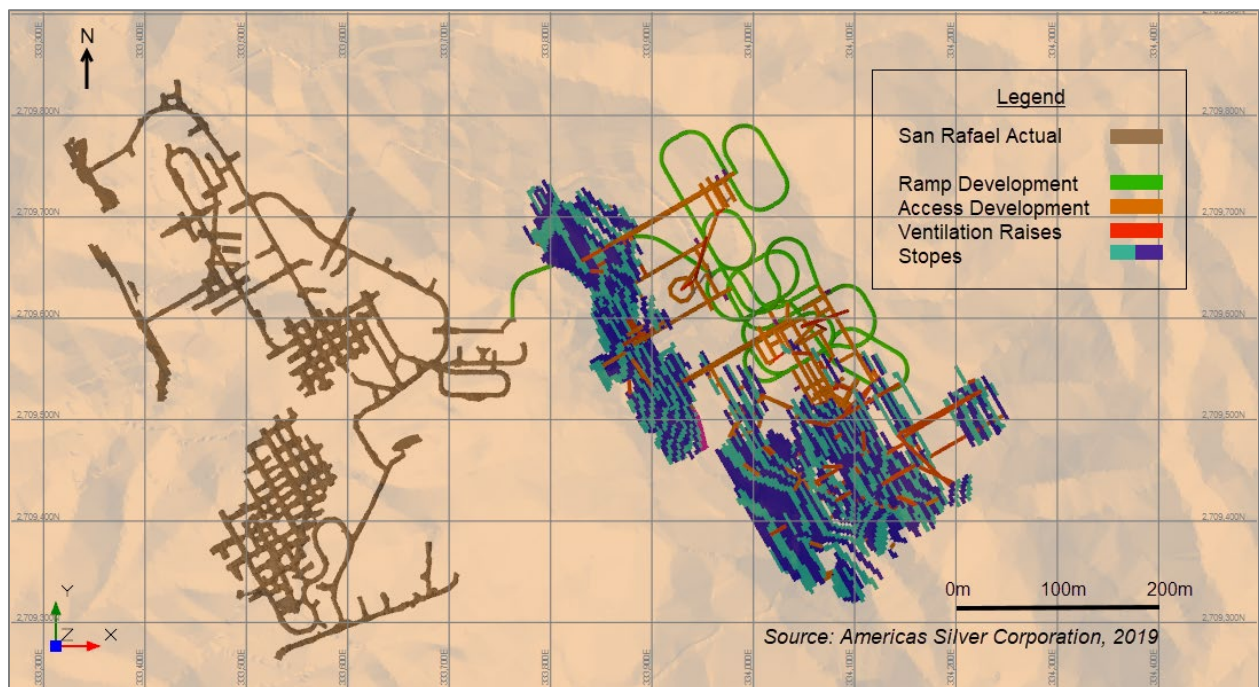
ZONE 120 AND SAN RAFAEL LAYOUT PLAN VIEW
